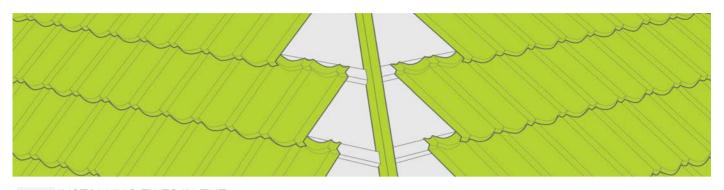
INSTALLING TILES IN THE INCLINED RIDGE AREA
